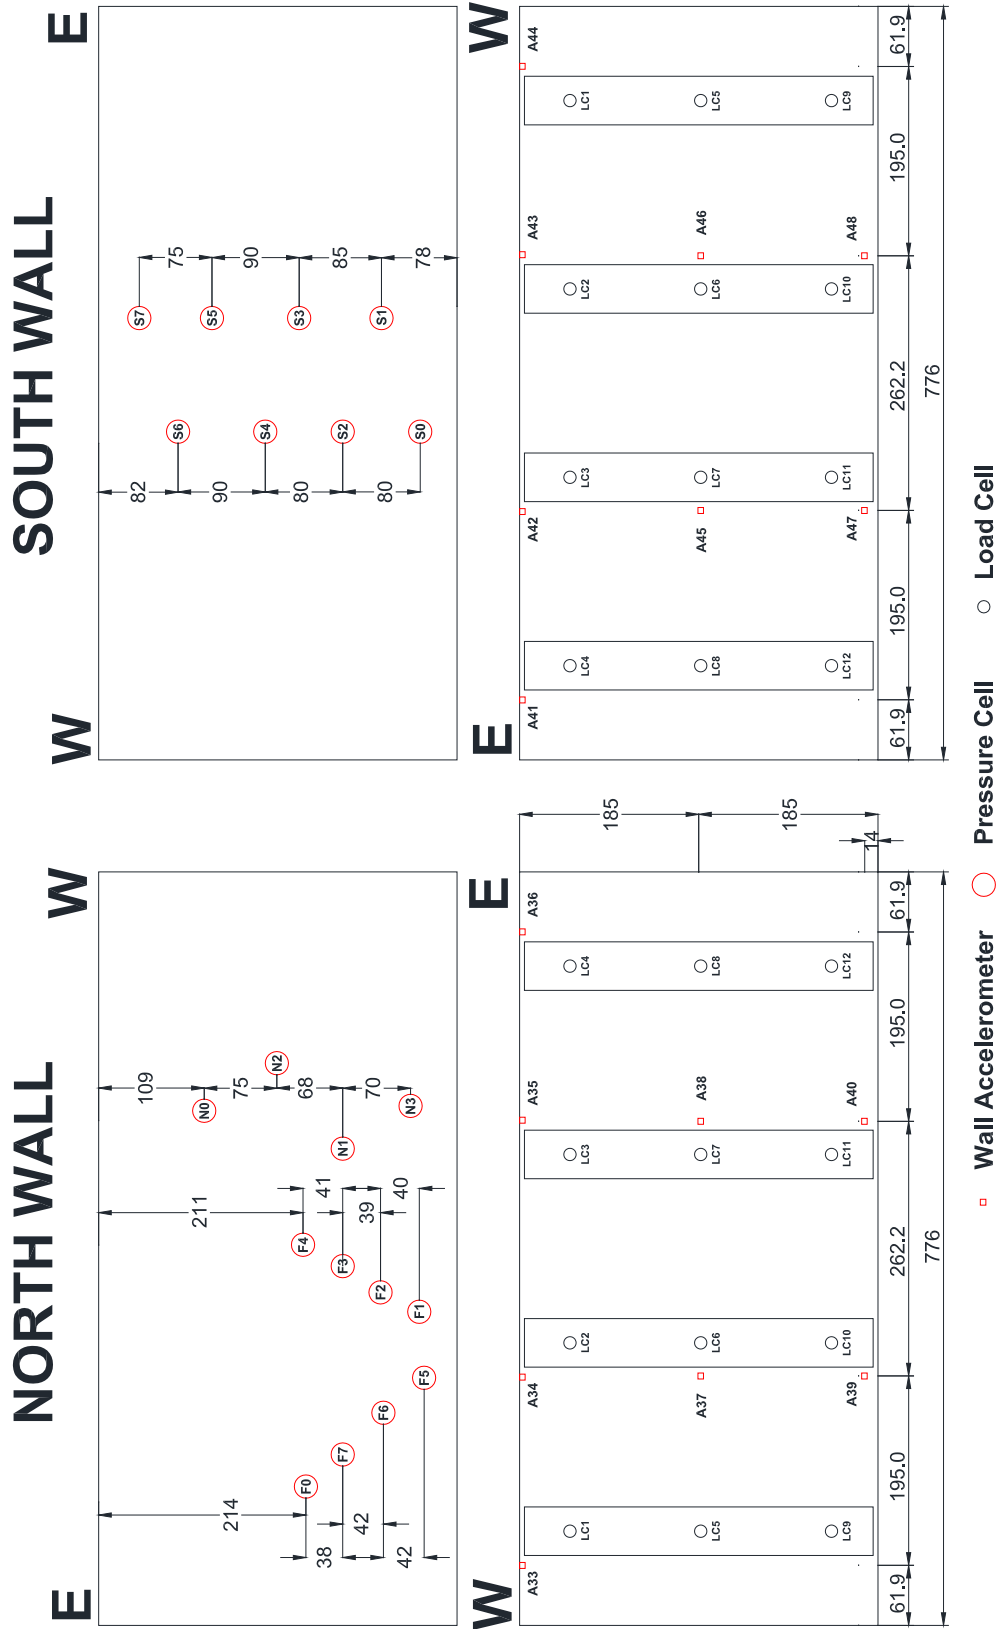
Location of sensors on basement walls (dimensions in mm)
